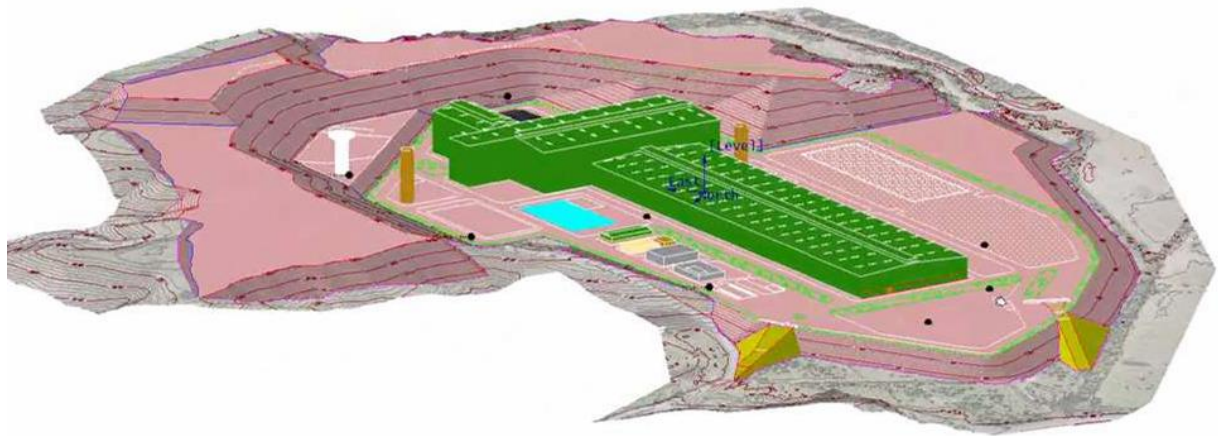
Diagrammatic view of the proposed steel manufacturing plant layout with proposed land modification against existing landform
